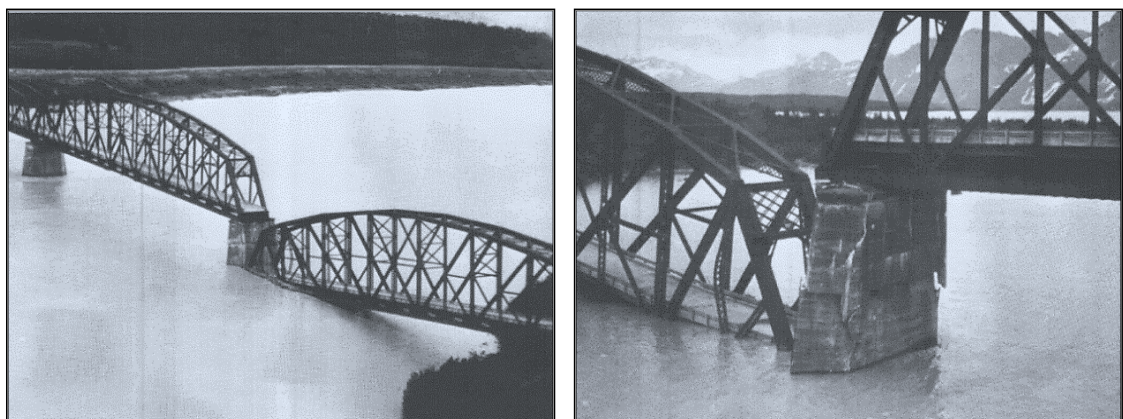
Collapse of the Million Dollar Bridge, (Kachadoorian, 1968)
